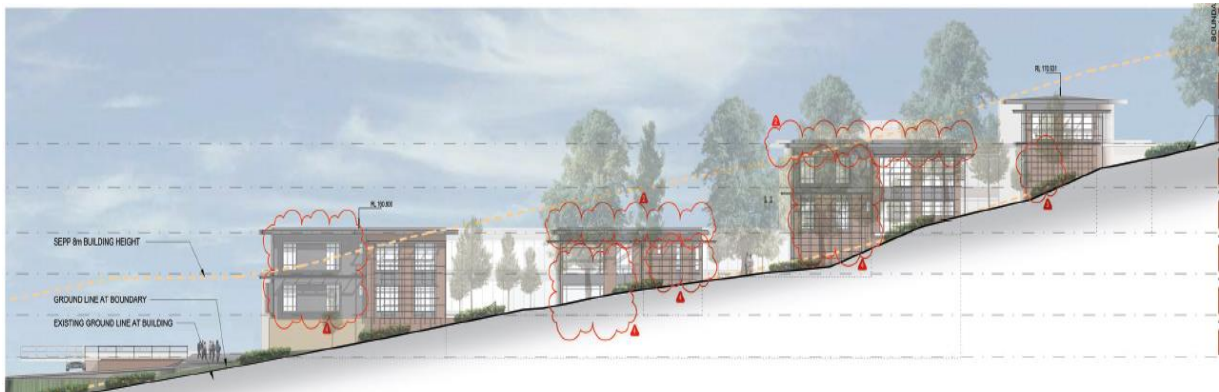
North Elevation, showing modified window scheme (source: Architectural Plans, prepared Thomson Adsett)
